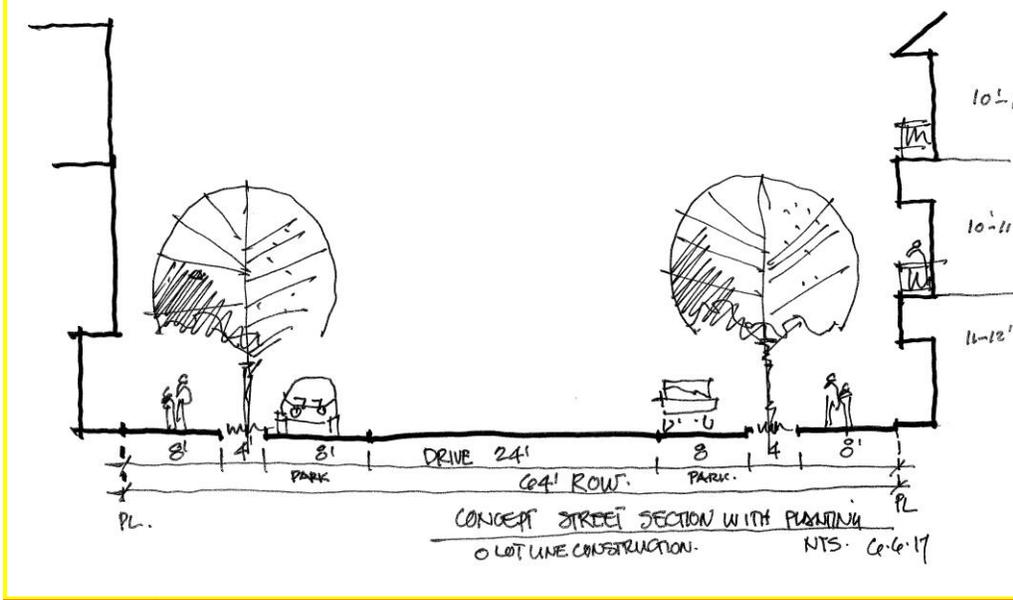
MAIN STREET SECTION B- with planting strip along road
